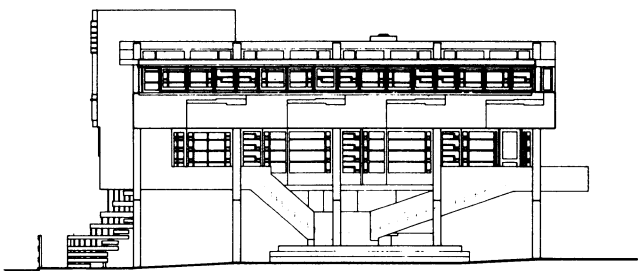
Schindler, Beach House, north elevation (*Oppositions*, 18 [Fall 1979], 68).
